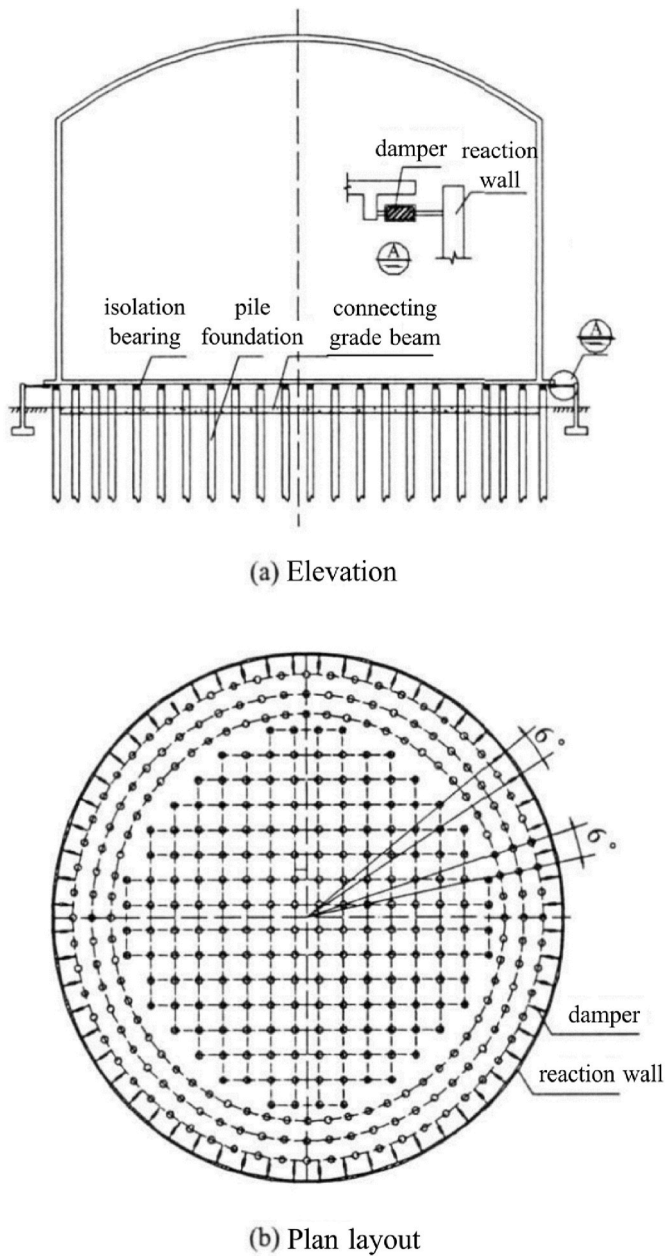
Hybrid seismic isolated storage tank (a) Elevation, (b) Plan layout.
